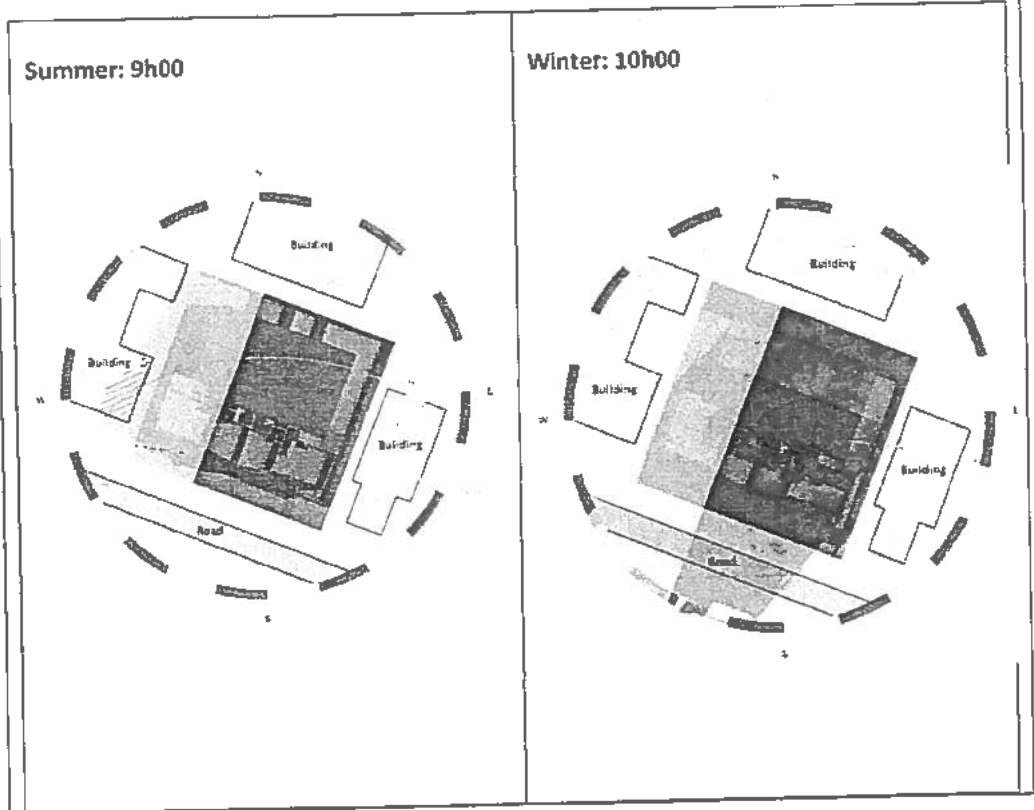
Sketch illustrating the views from the proposed upgraded townhouse complex
